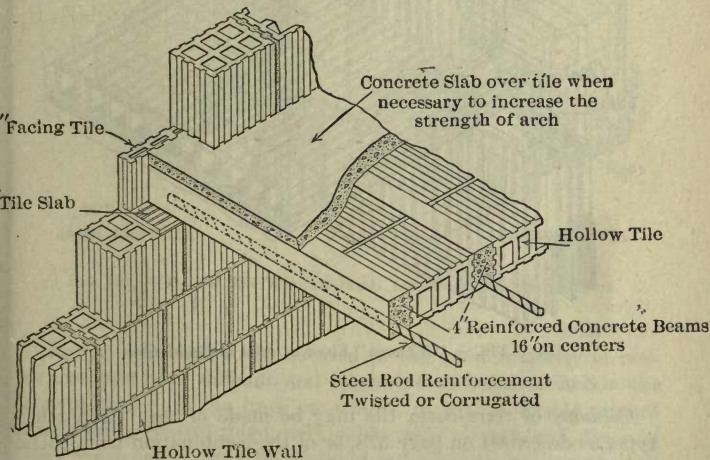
Hollow Tile Wall and "Combination" Floor Construction.
